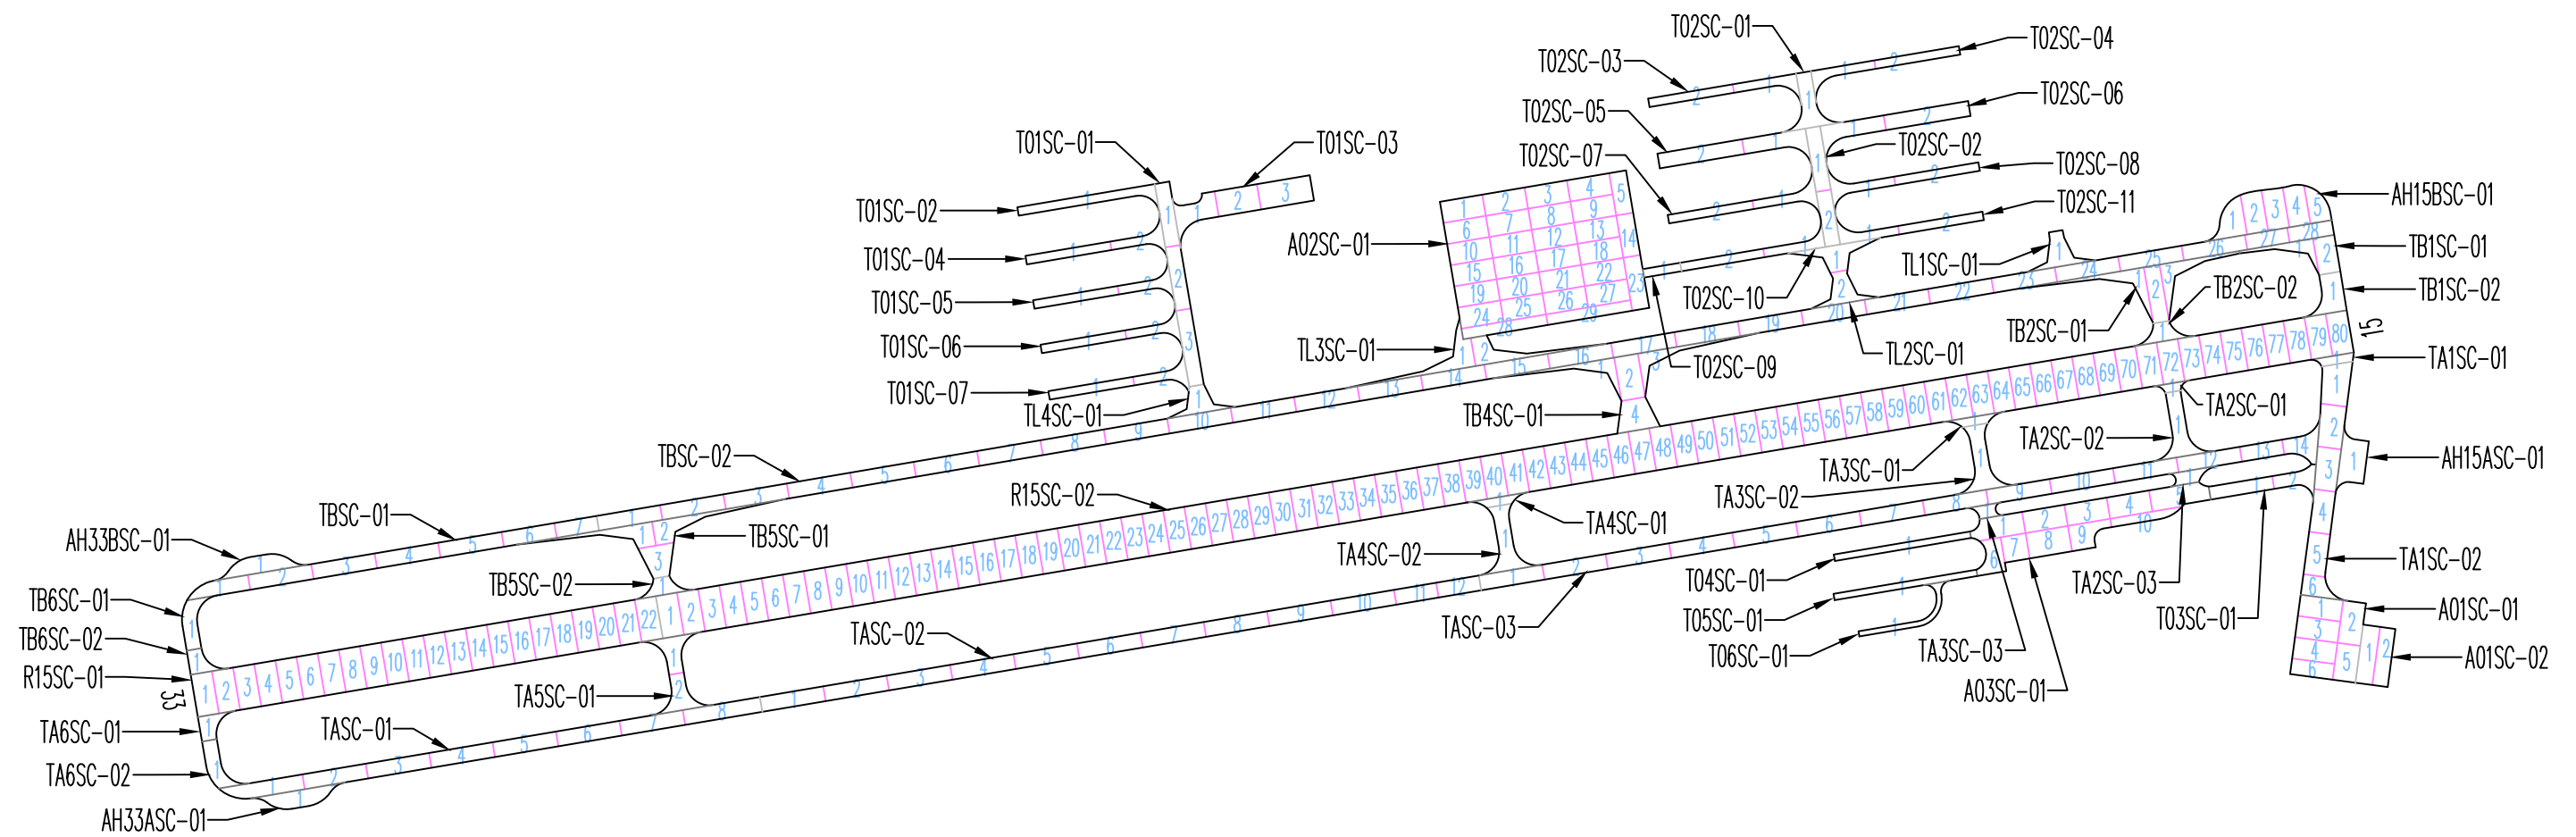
B. Airport Layout, Dimensions and Pavement Cross-Sections – Aprons and Hangar Areas.
